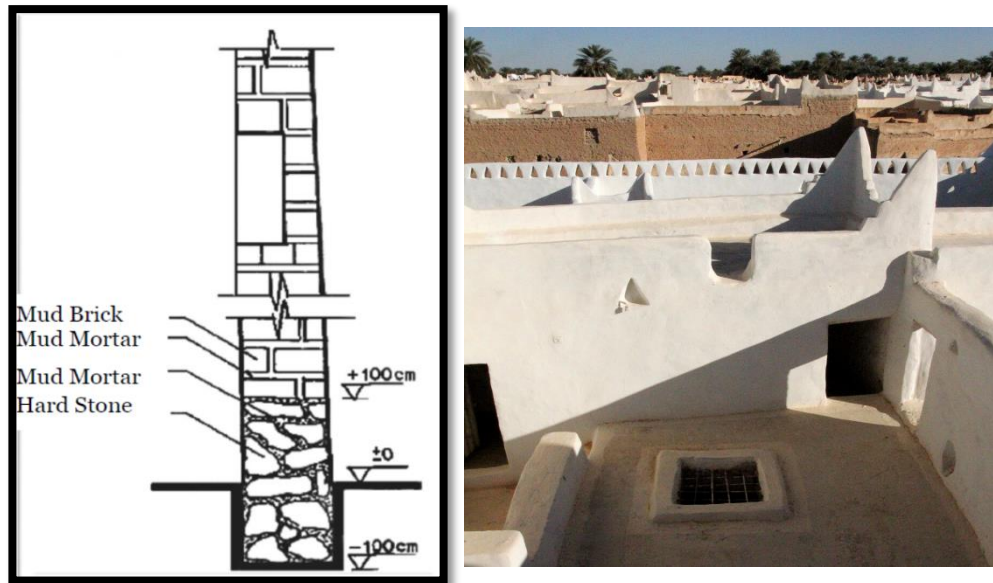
Cross-section and photo in walls of a traditional dwelling (Report of Ghadames Libya 1980)
